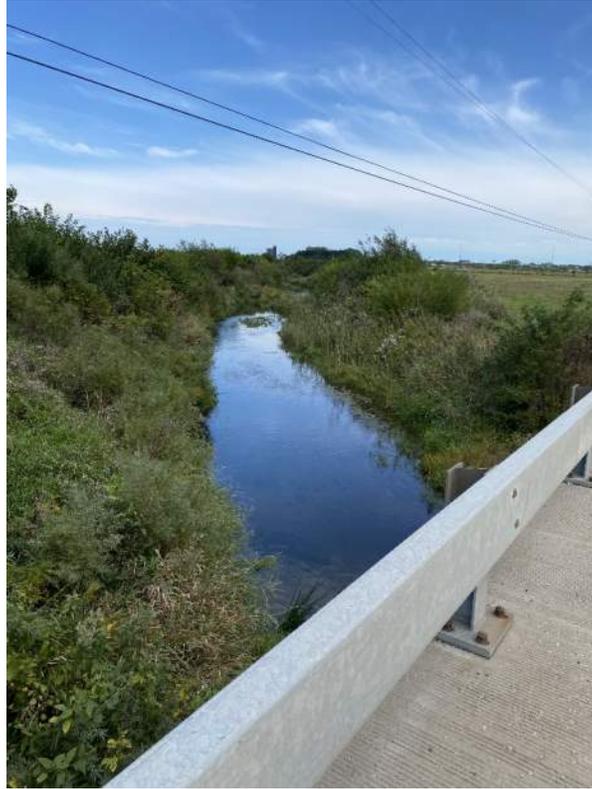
Rock Creek, looking Upstream/Northeast (IMG\_9131)
